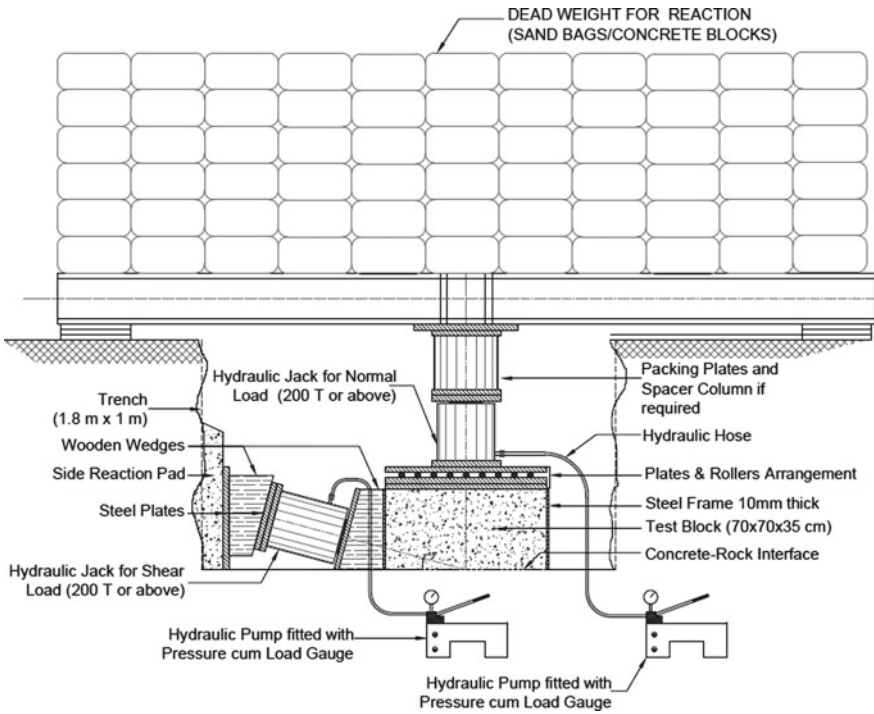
Typical sketch showing equipment setup for shear tests in open
